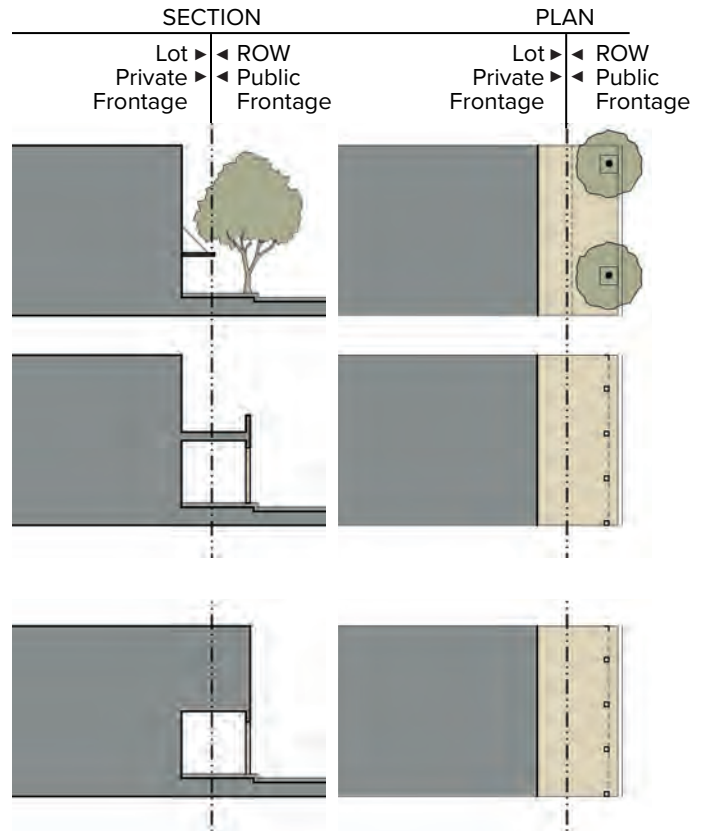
Graphic illustrating plan and section view of Frontage types Storefront, Gallery/Colonnade, and Arcade.
